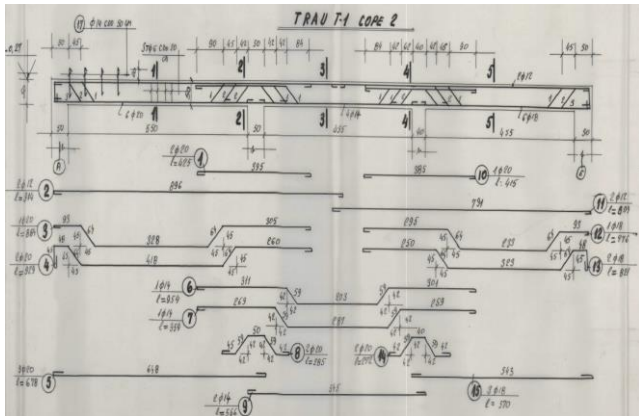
Section and reinforcement detail of beam T-1 placed on axis 1 of the ground floor
